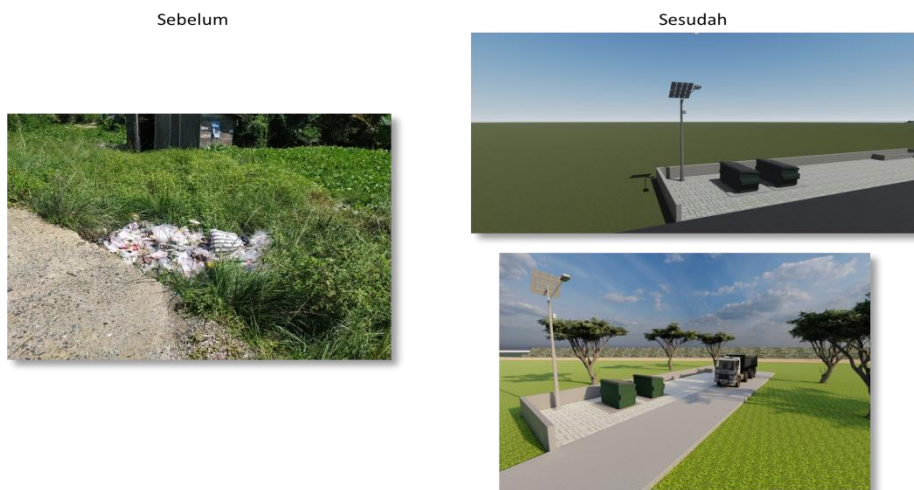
Arrangement of Temporary Waste Disposal Site (TPS) Satui Barat
